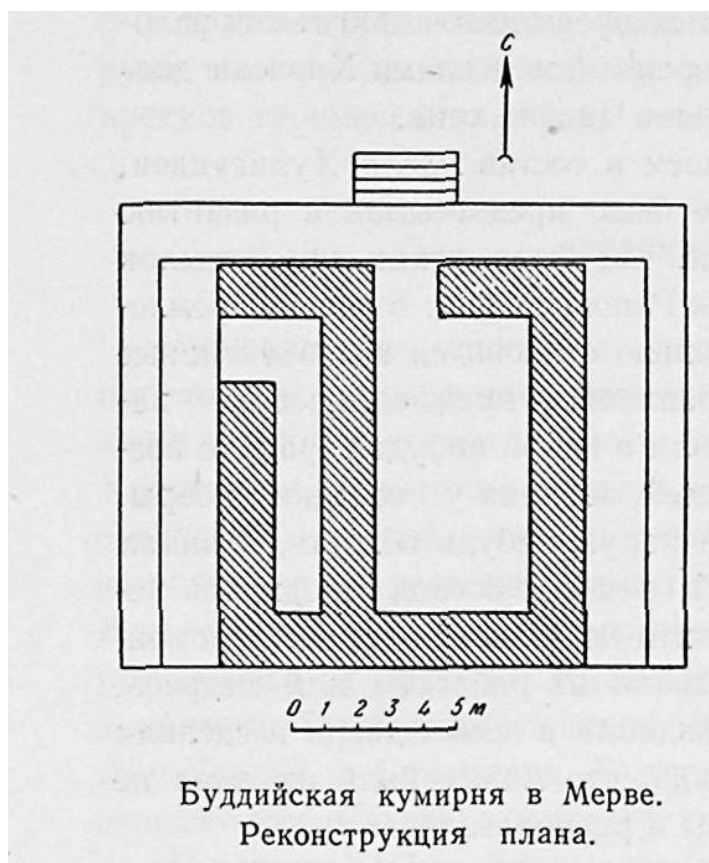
Plan of Buddhist shrine excavated to the south of Sultan Kala, it should be noted that Pugachenkova's plans are often partially reconstructions (Pugachenkova 1958, 352)
